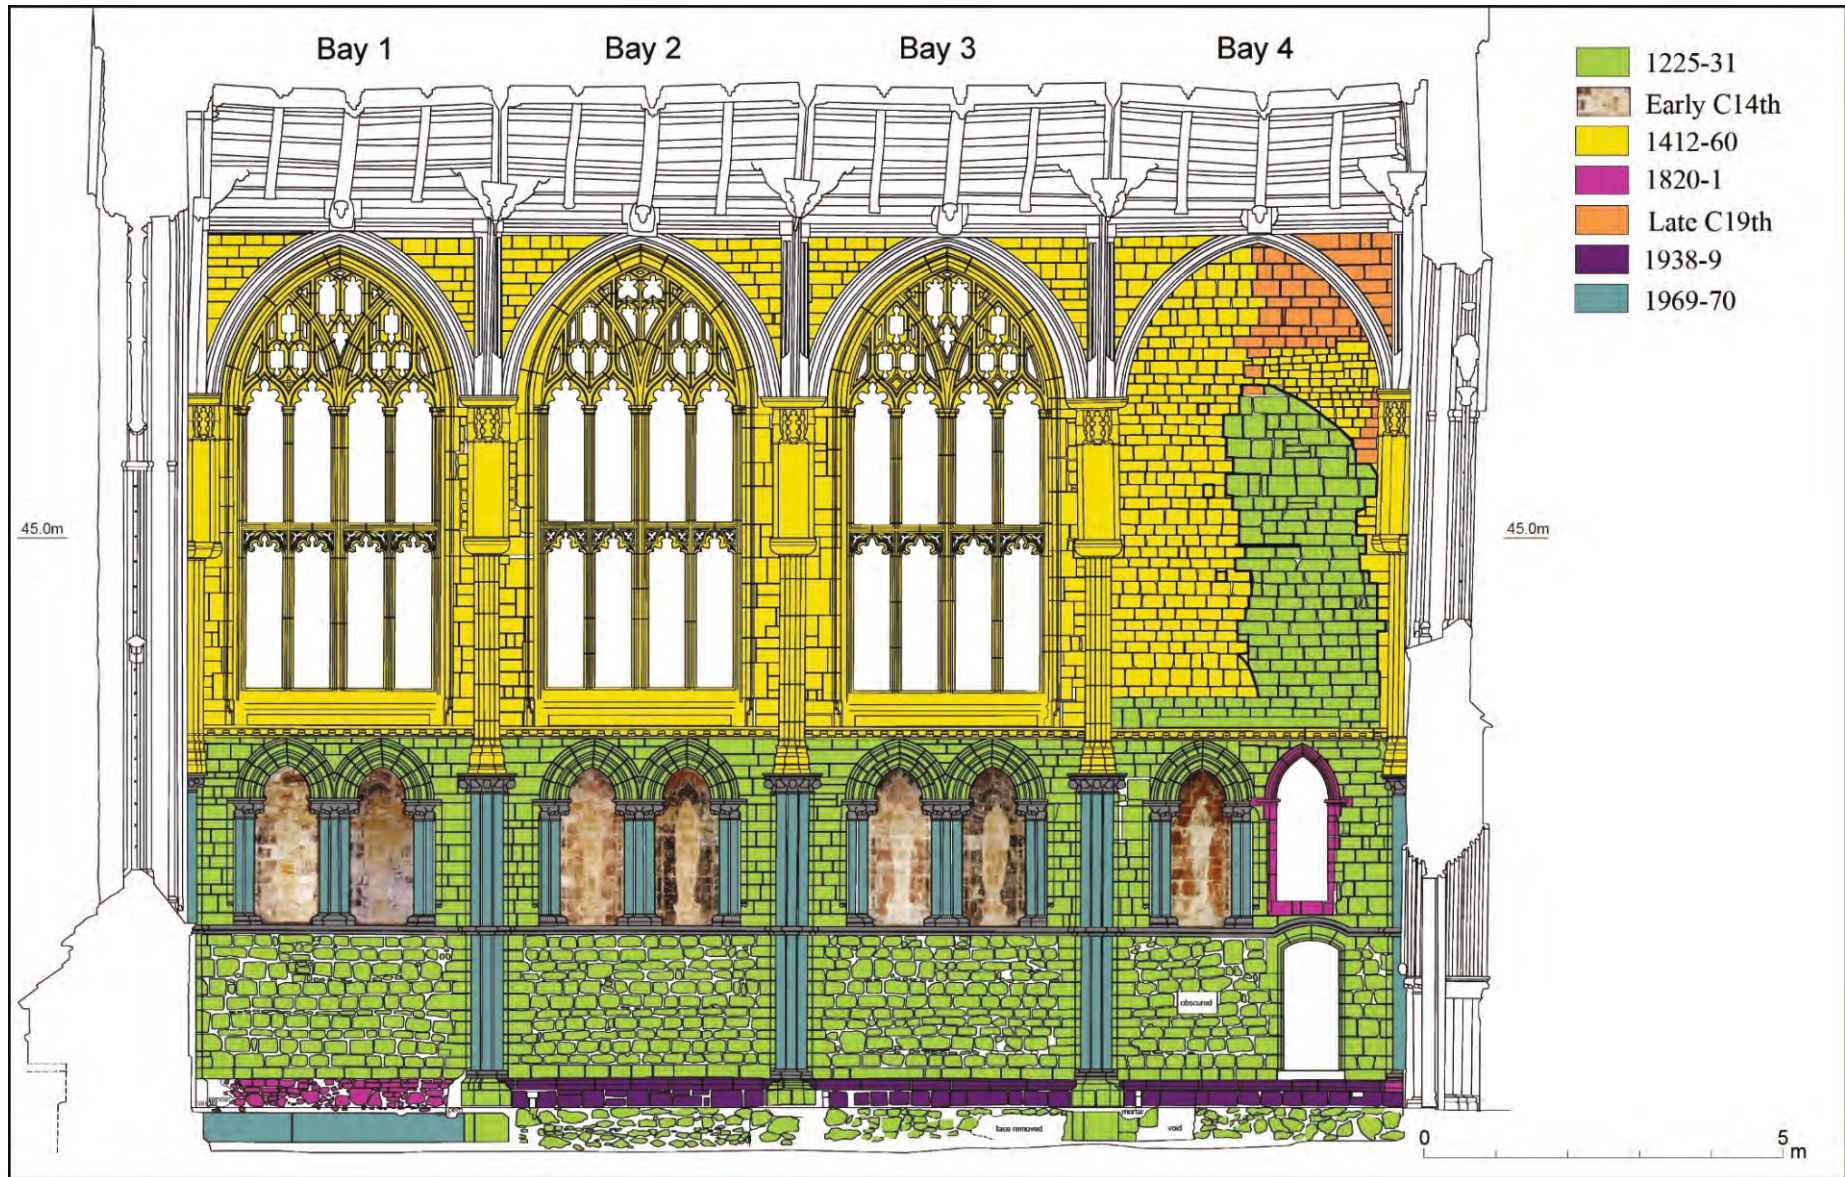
The Chapter House, internal face of the south wall: phasing (*J. Allan/T. Ives*).
